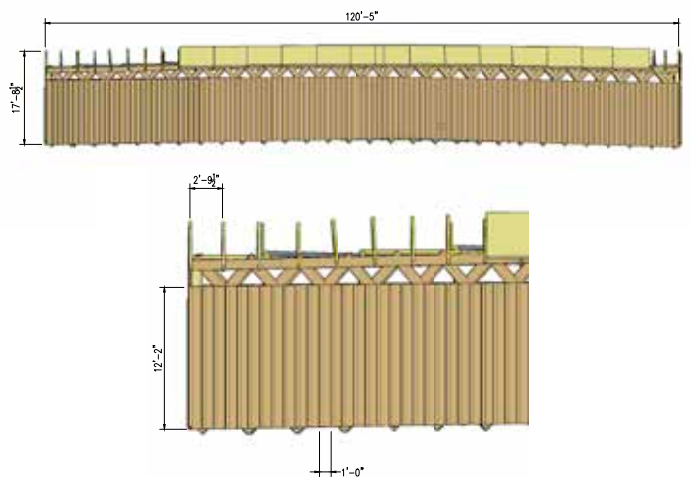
CAD drawing and dimensions of side wall and trusses of the Cedarburg Bridge (UMD NRRI).
